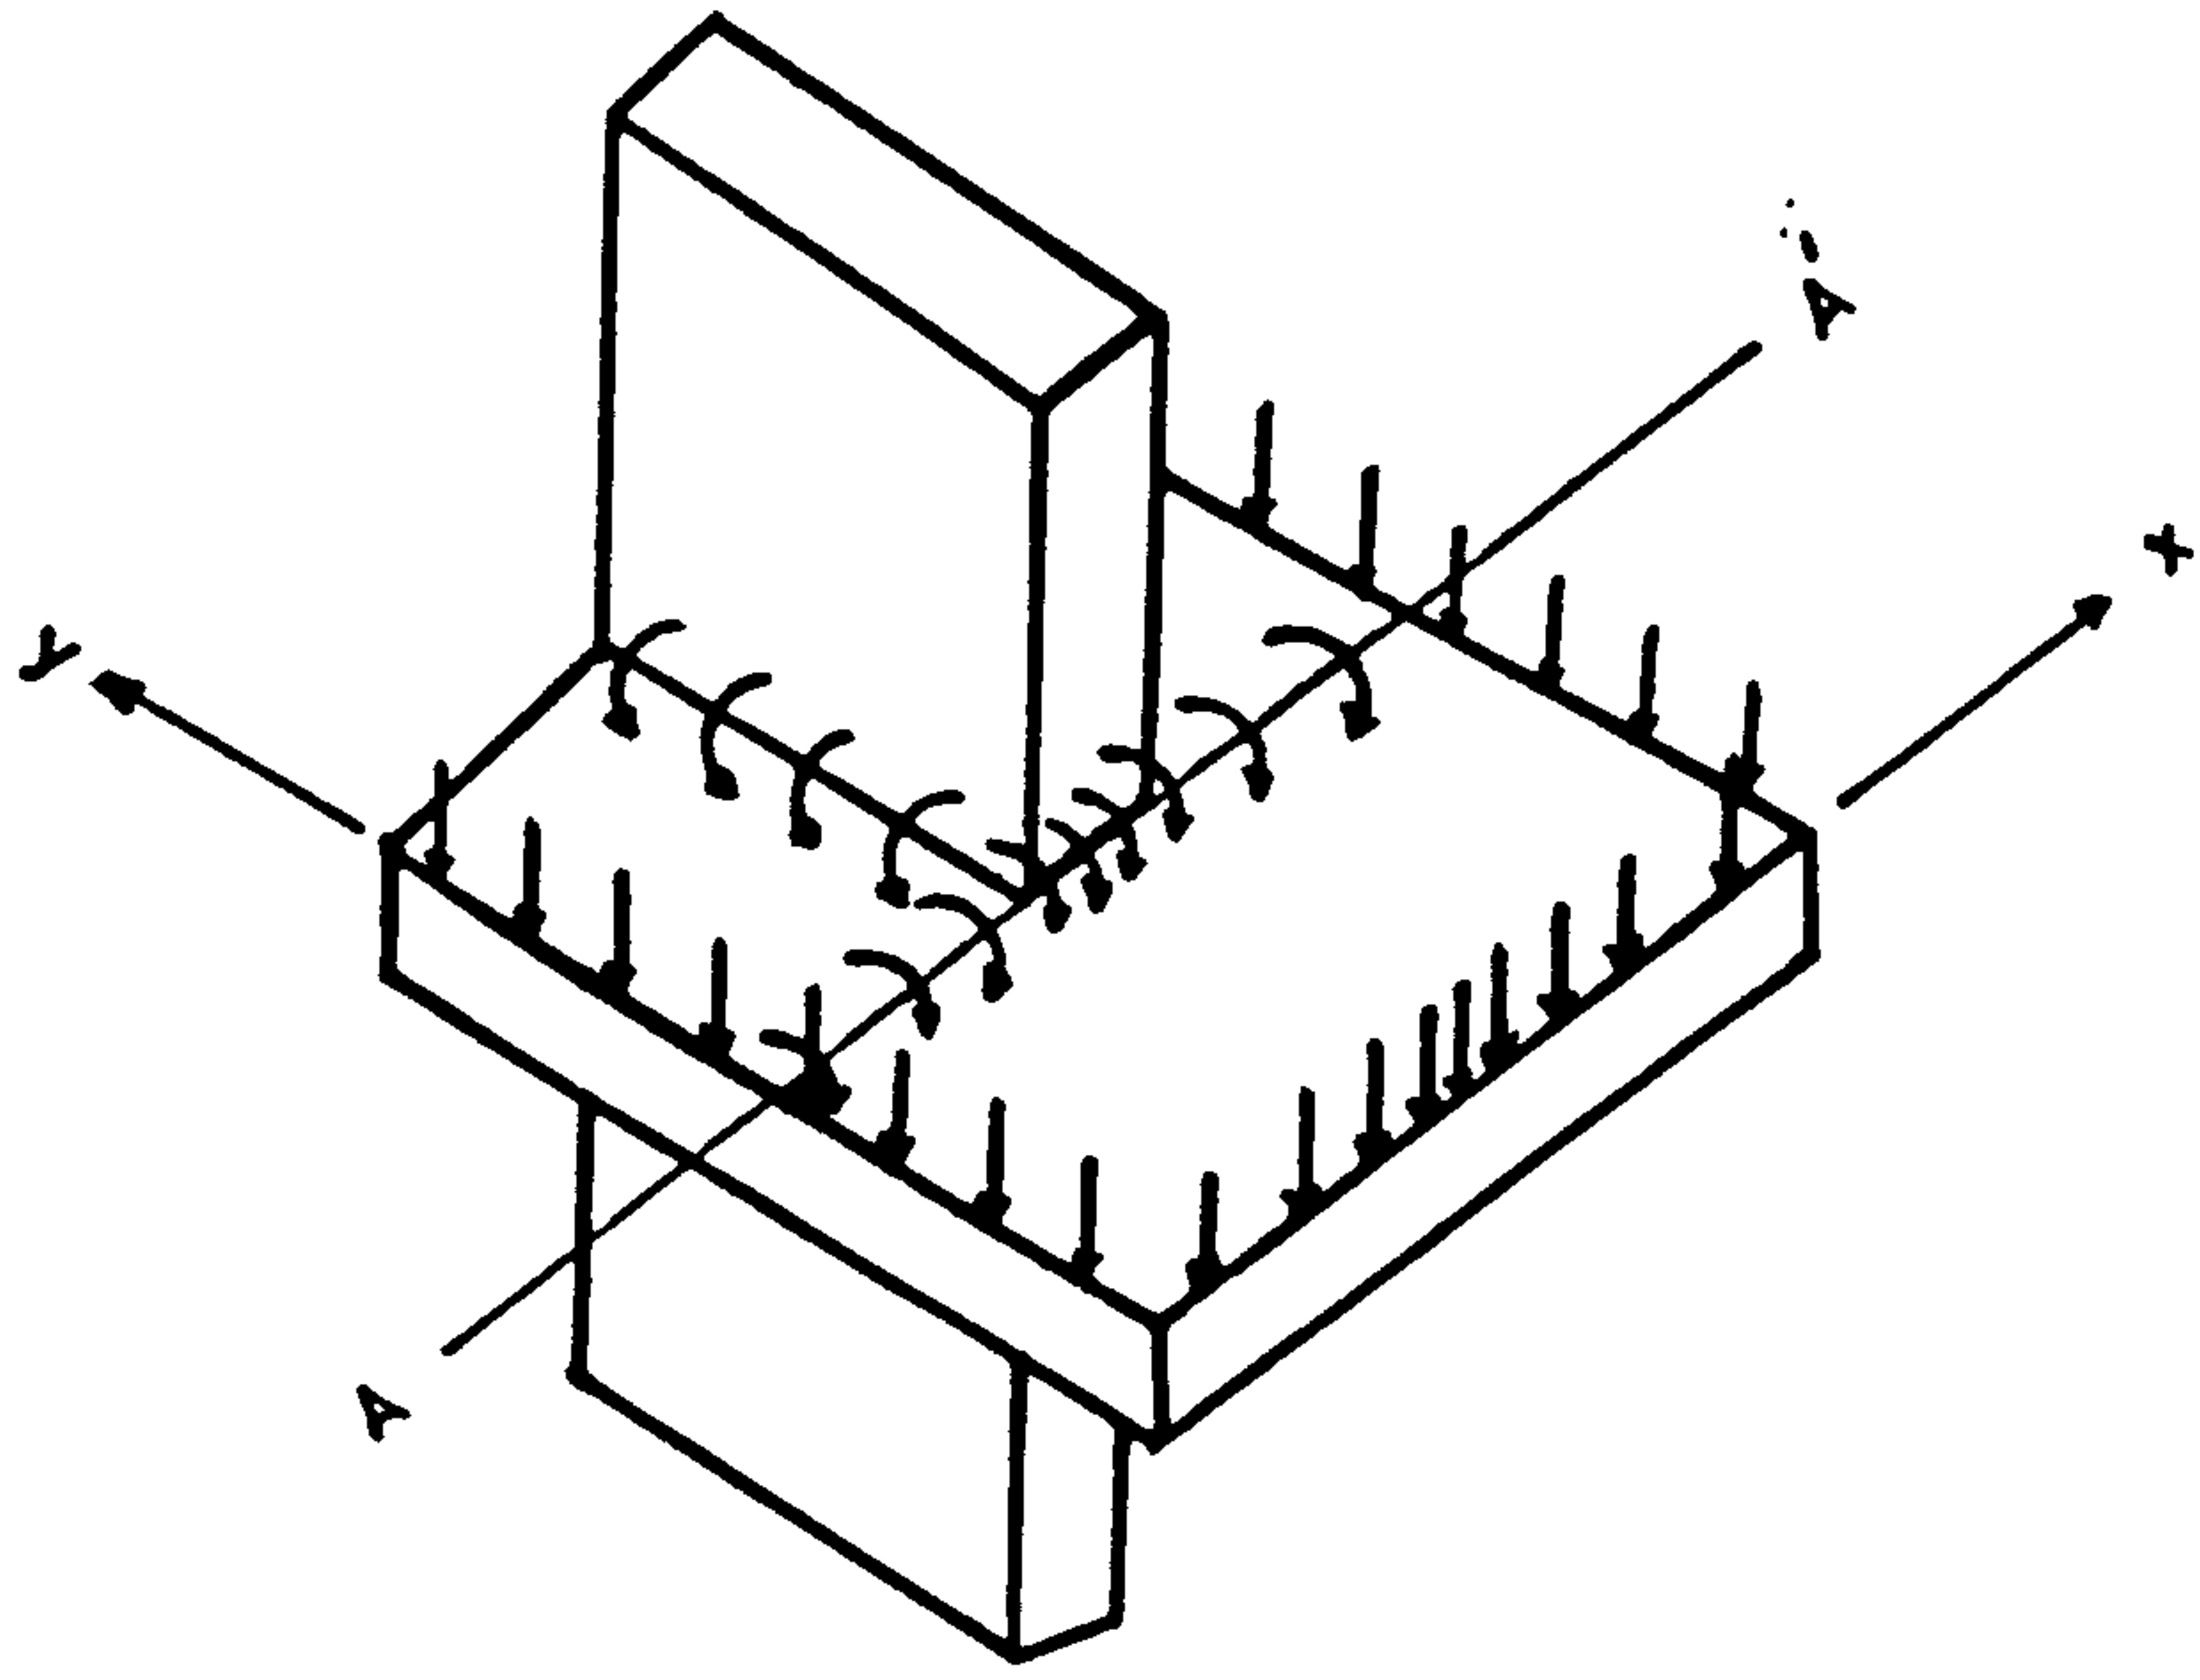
A typical wall-slab connection showing moments and shear due to lateral and gravity loads.
